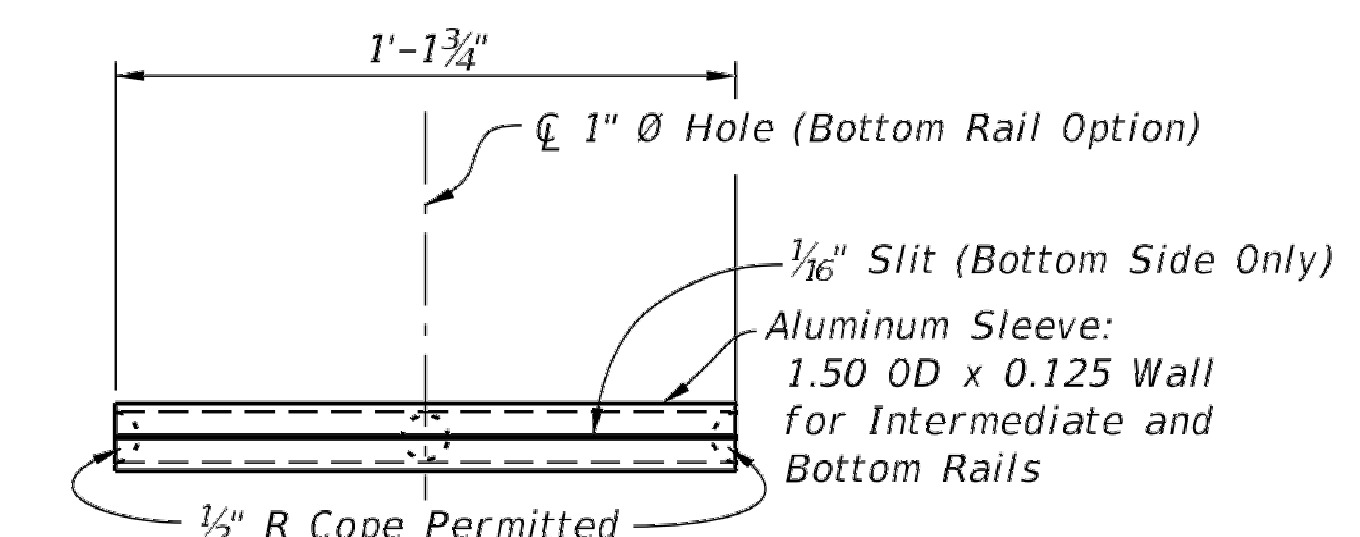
DETAIL "B" - EXPANSION JOINT (FIELD SPLICE SLIP JOINT SIMILAR)
